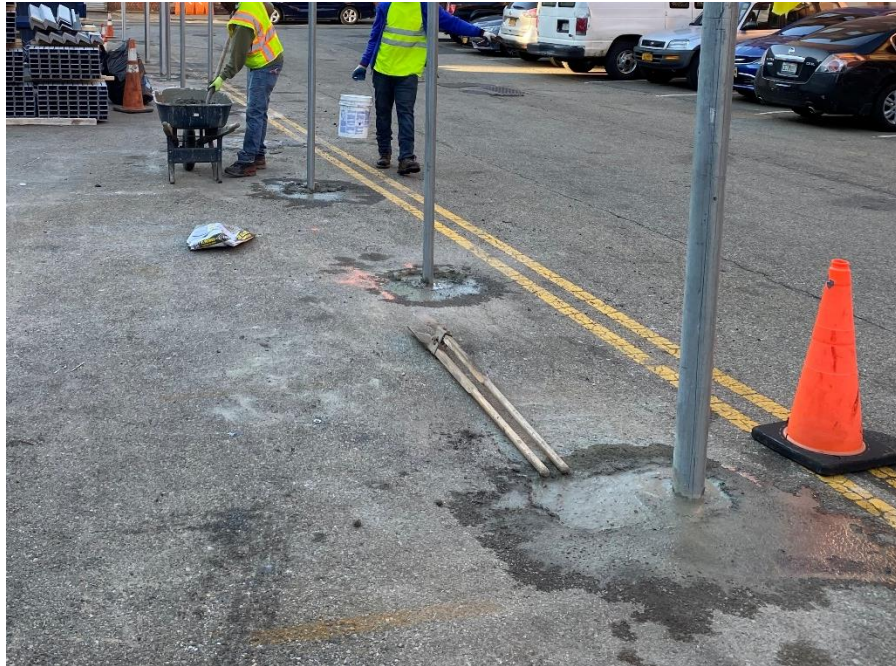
Concrete filled post-holes and restored site cap (facing northwest) – 3/10/2021
